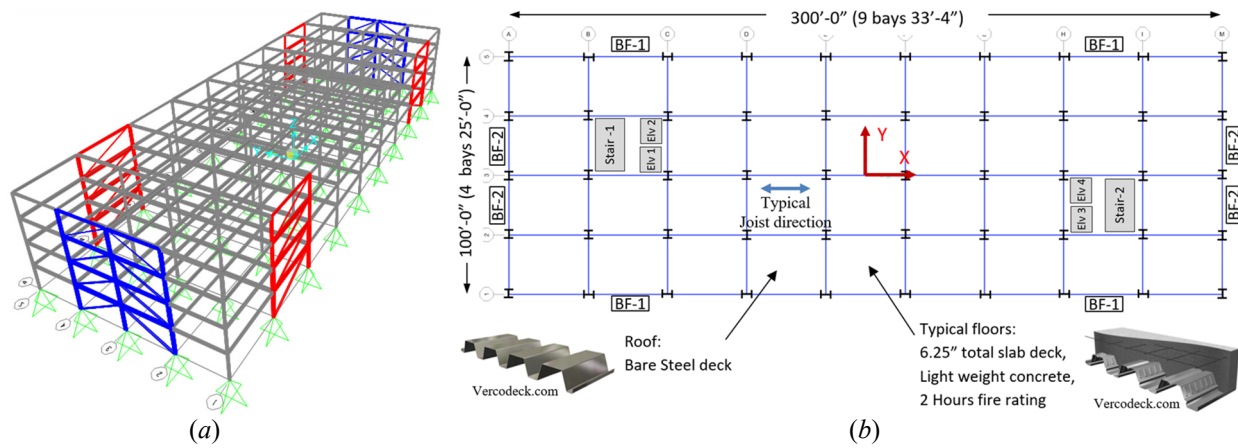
Schematic view of four-story archetype building: (a) 3D view, (b) typical plan
